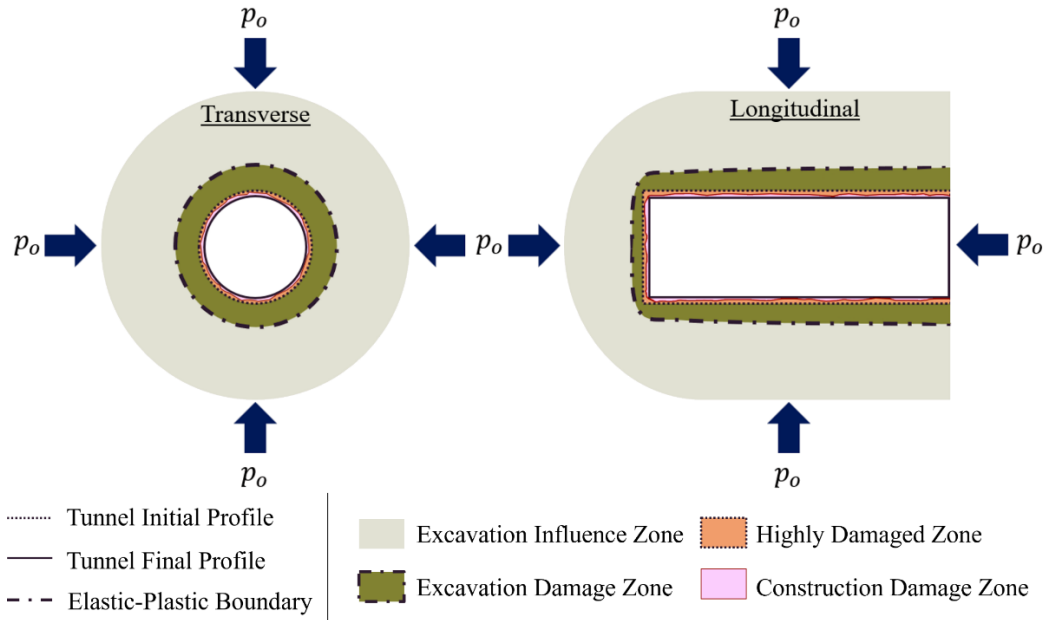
Schematic illustration for transversal and longitudinal cross sections of the different zones of induced damage around the tunnel constructed with TBM under hydrostatic loading (modified after Read (2004) and Perras and Diederichs (2016)).
